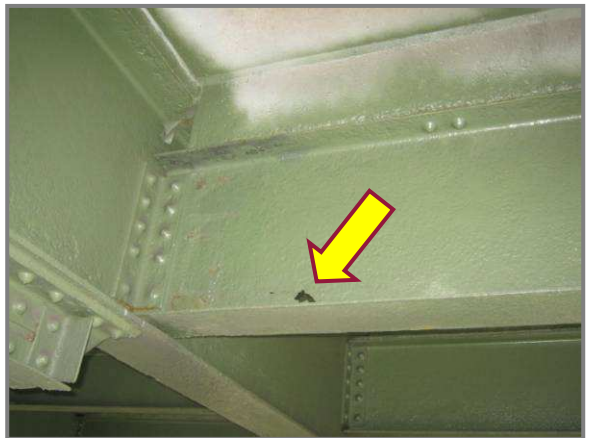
3" Diameter holed through section on the first interior stringer near AU118N.
